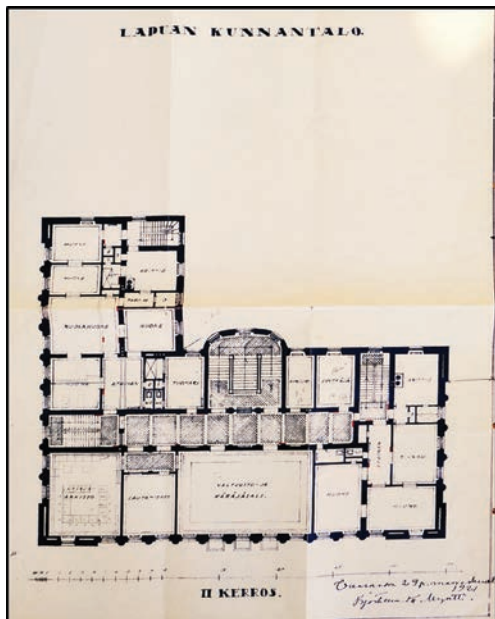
Lapua Town hall 2nd floor. Originals in Lapua Town Archives. Photo by the author.
